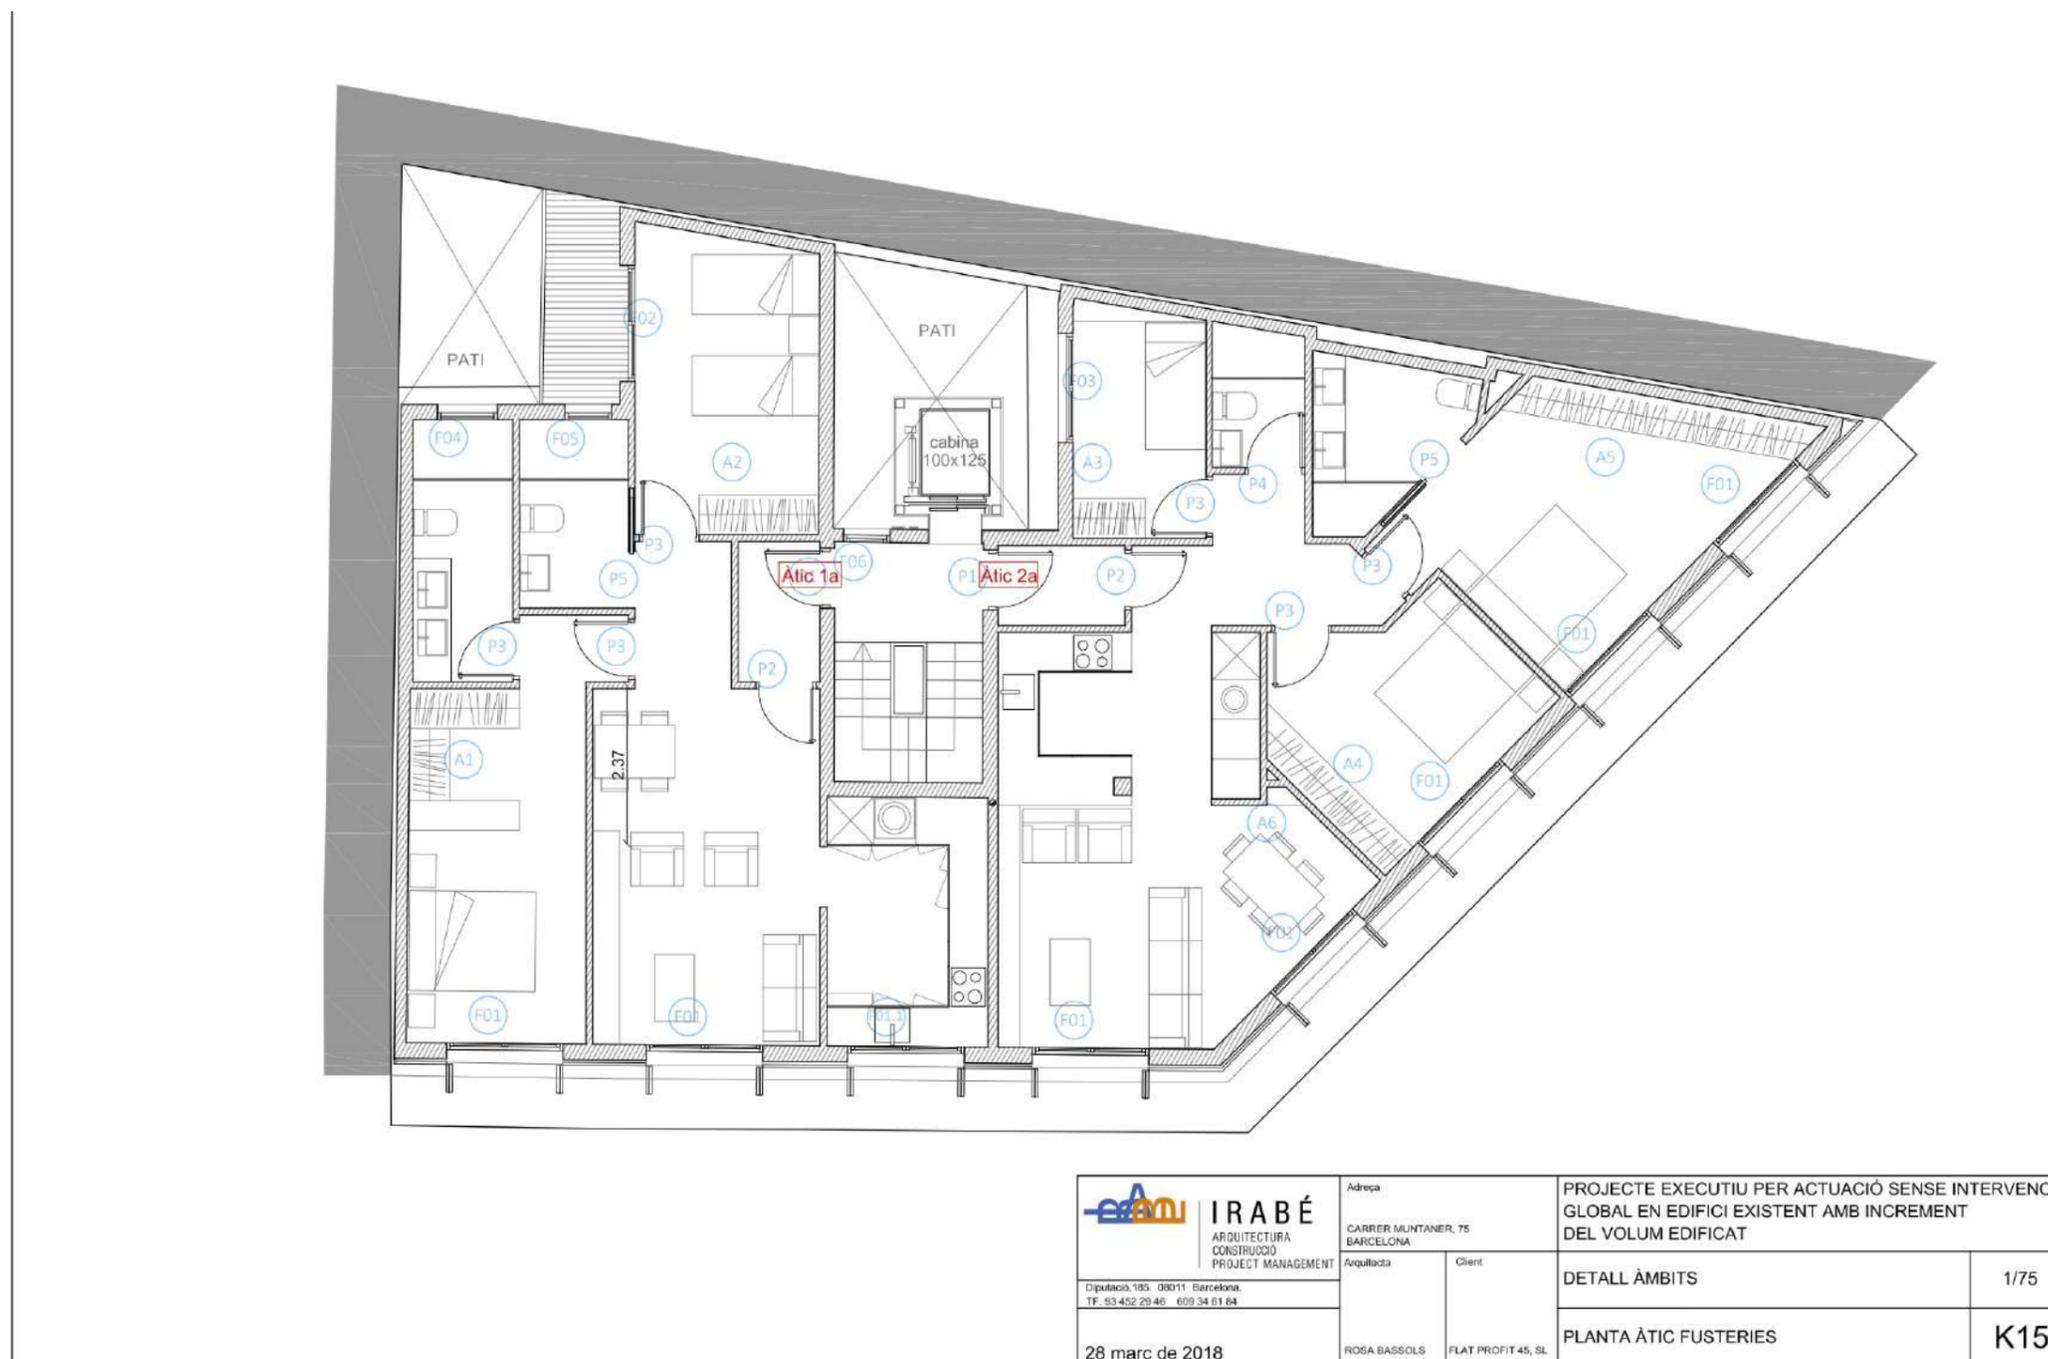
Floorplan of the proposed attic apartments, showing furniture.
